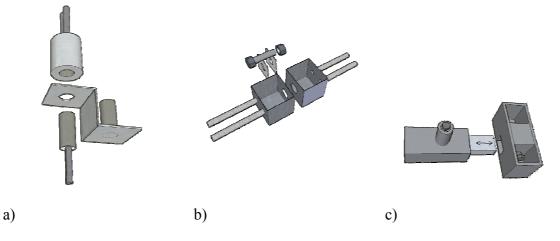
Including connection devices: a) wall-to-floor, b) wall-to-wall/ floor-to-floor and c) floor-to-floor device in case of big shear forces.
